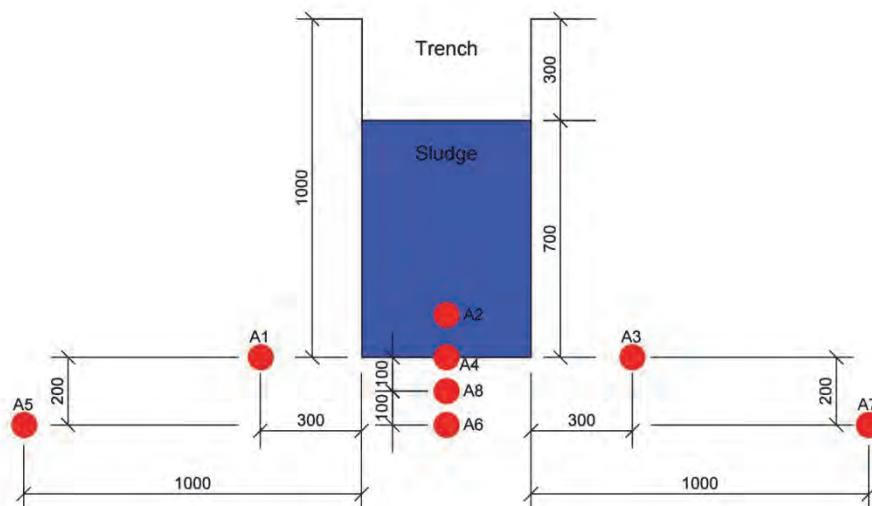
Section View showing locations of soil samples around entrenched sludge
